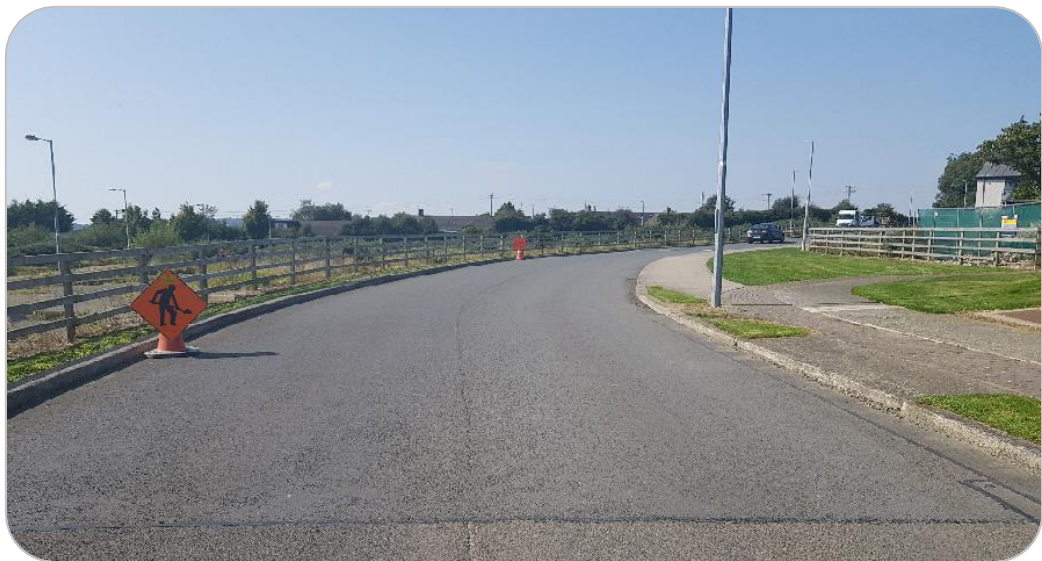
Proposed access location on Clonattin Village (view to west, access on left)
